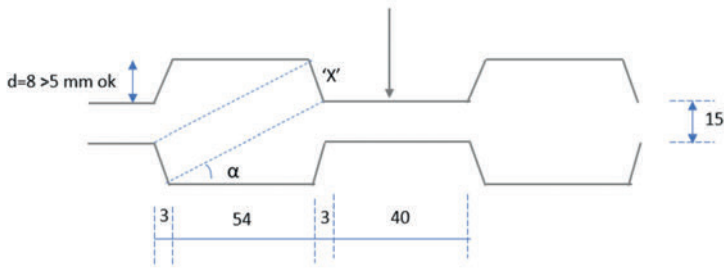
Eurocode 2 compliant geometry of a shear key as example
